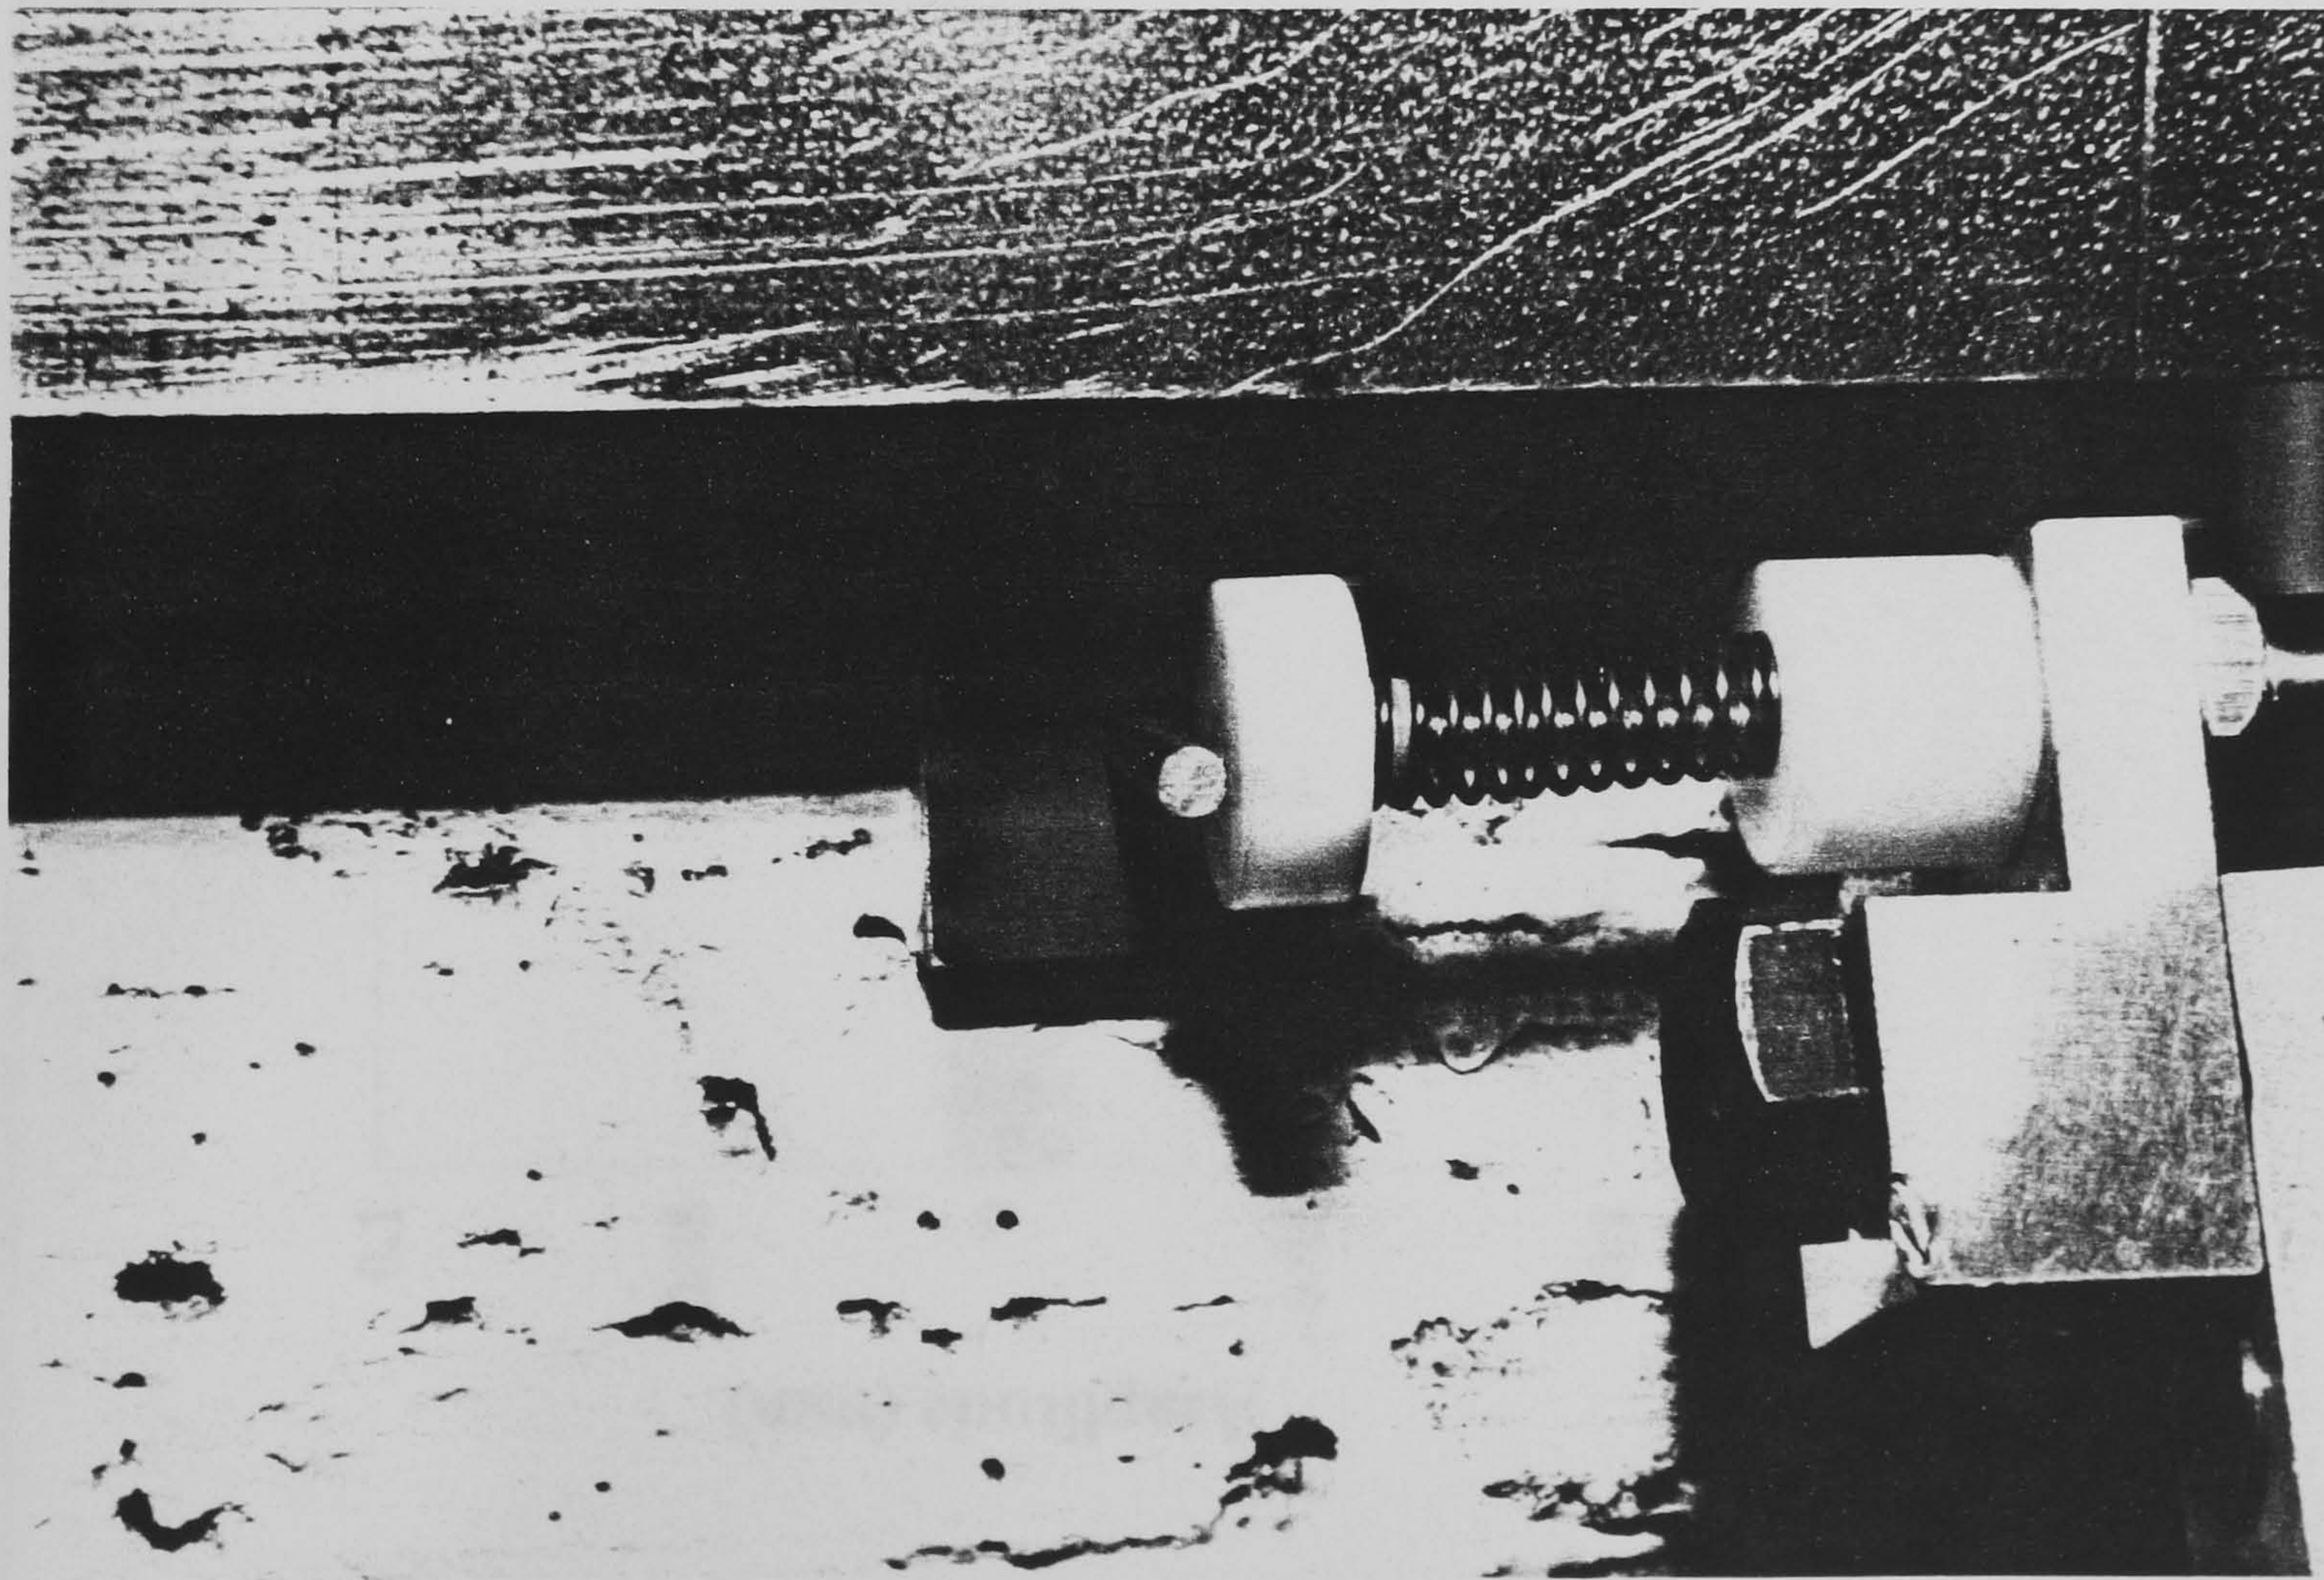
Close-up of alternative LVDT set-up with Teflon fixings
